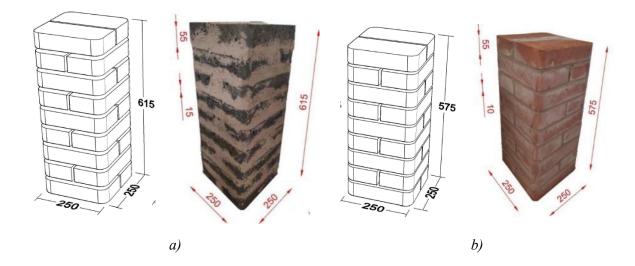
Specimens dimensions, in mm. a) Tuff stone and b) clay brick masonry.
